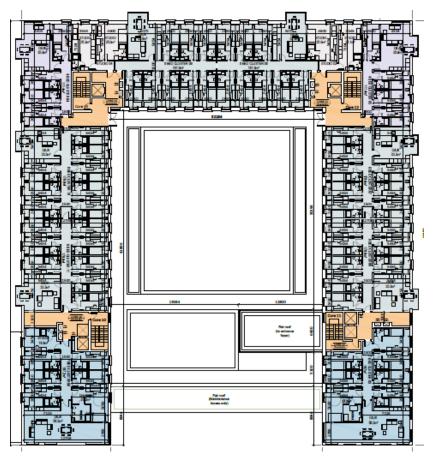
Proposed Student Residences B2 – Second and Third Floor Plans
